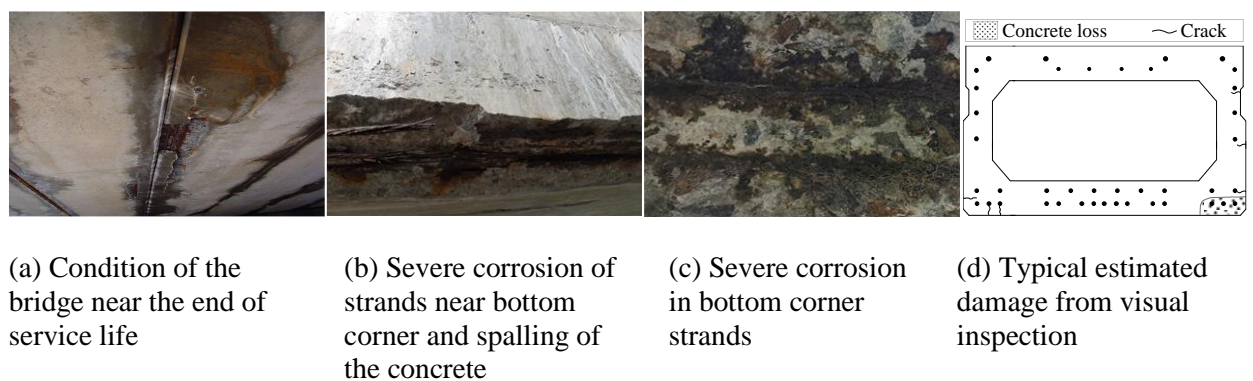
Corrosion-induced damage in the box-section girder
